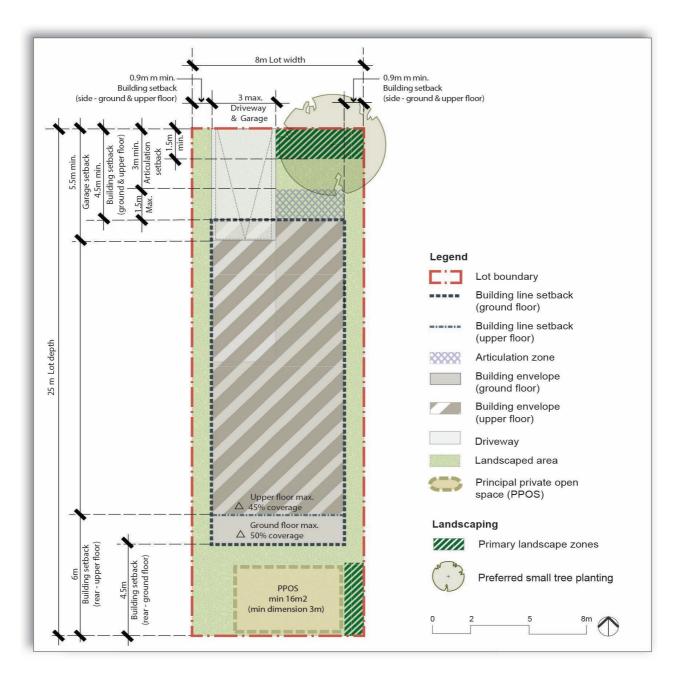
Typical lot layout on lots ≥8m but ≤9m
